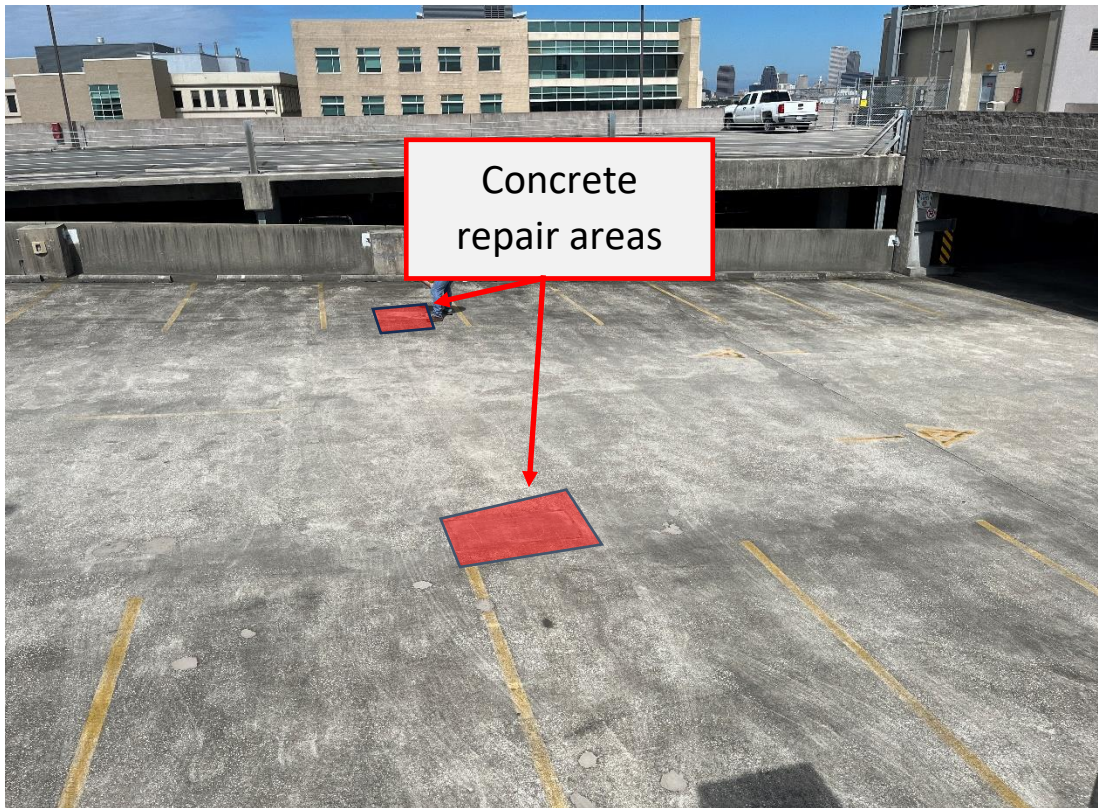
Unsound/spalling/damaged concrete in ramp areas to be repaired.
